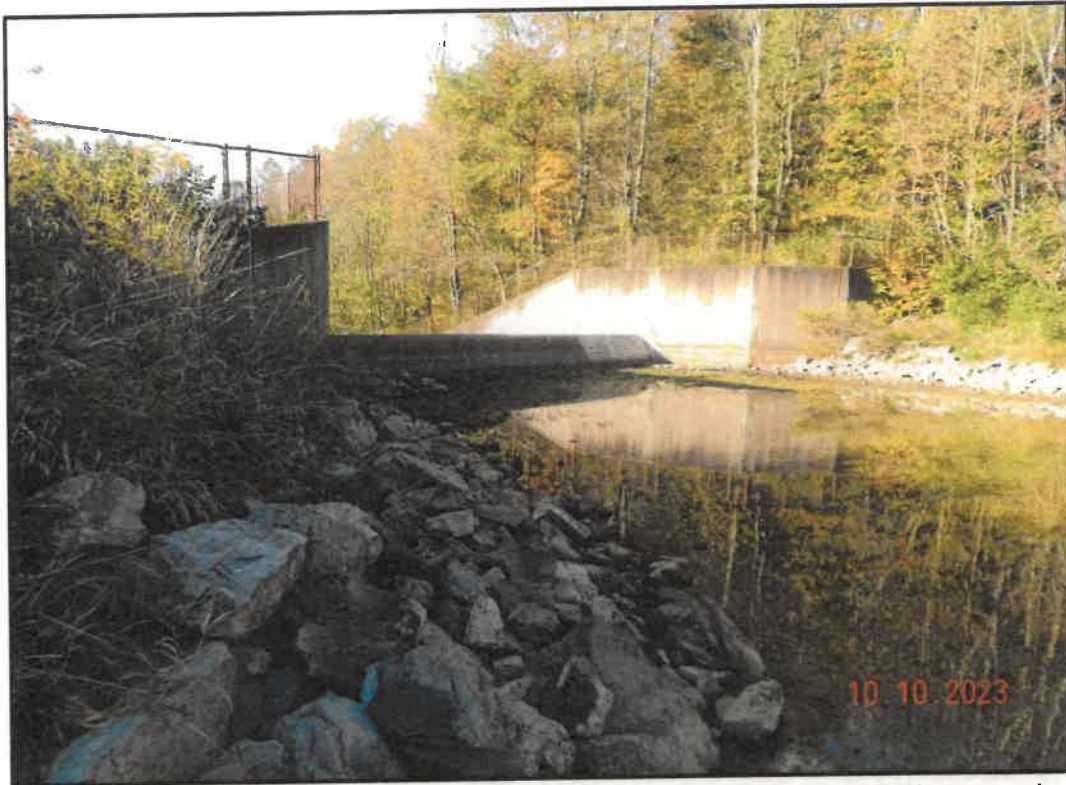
View of Spillway Approach Channel, Note underbrush that needs cut
